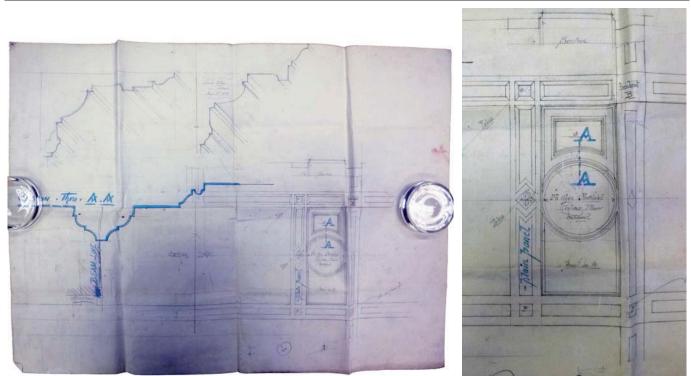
(left): Details of mouldings, dated c1903 (CAC(B) Z/1028/1 c1903) Plate 68 (right): Details of mouldings, dated c1903 (CAC(B) Z/1028/1 c1903)
